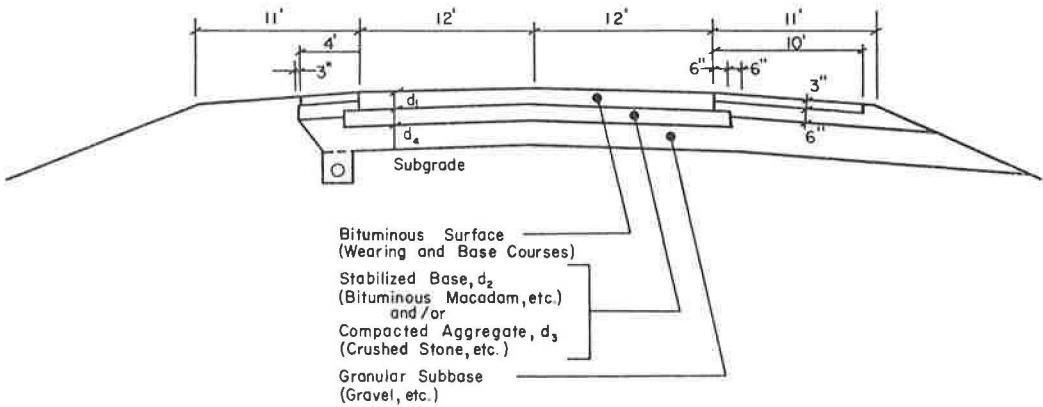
Typical cross section of a flexible pavement with subbase through the shoulder for a four-lane highway, one direction.
